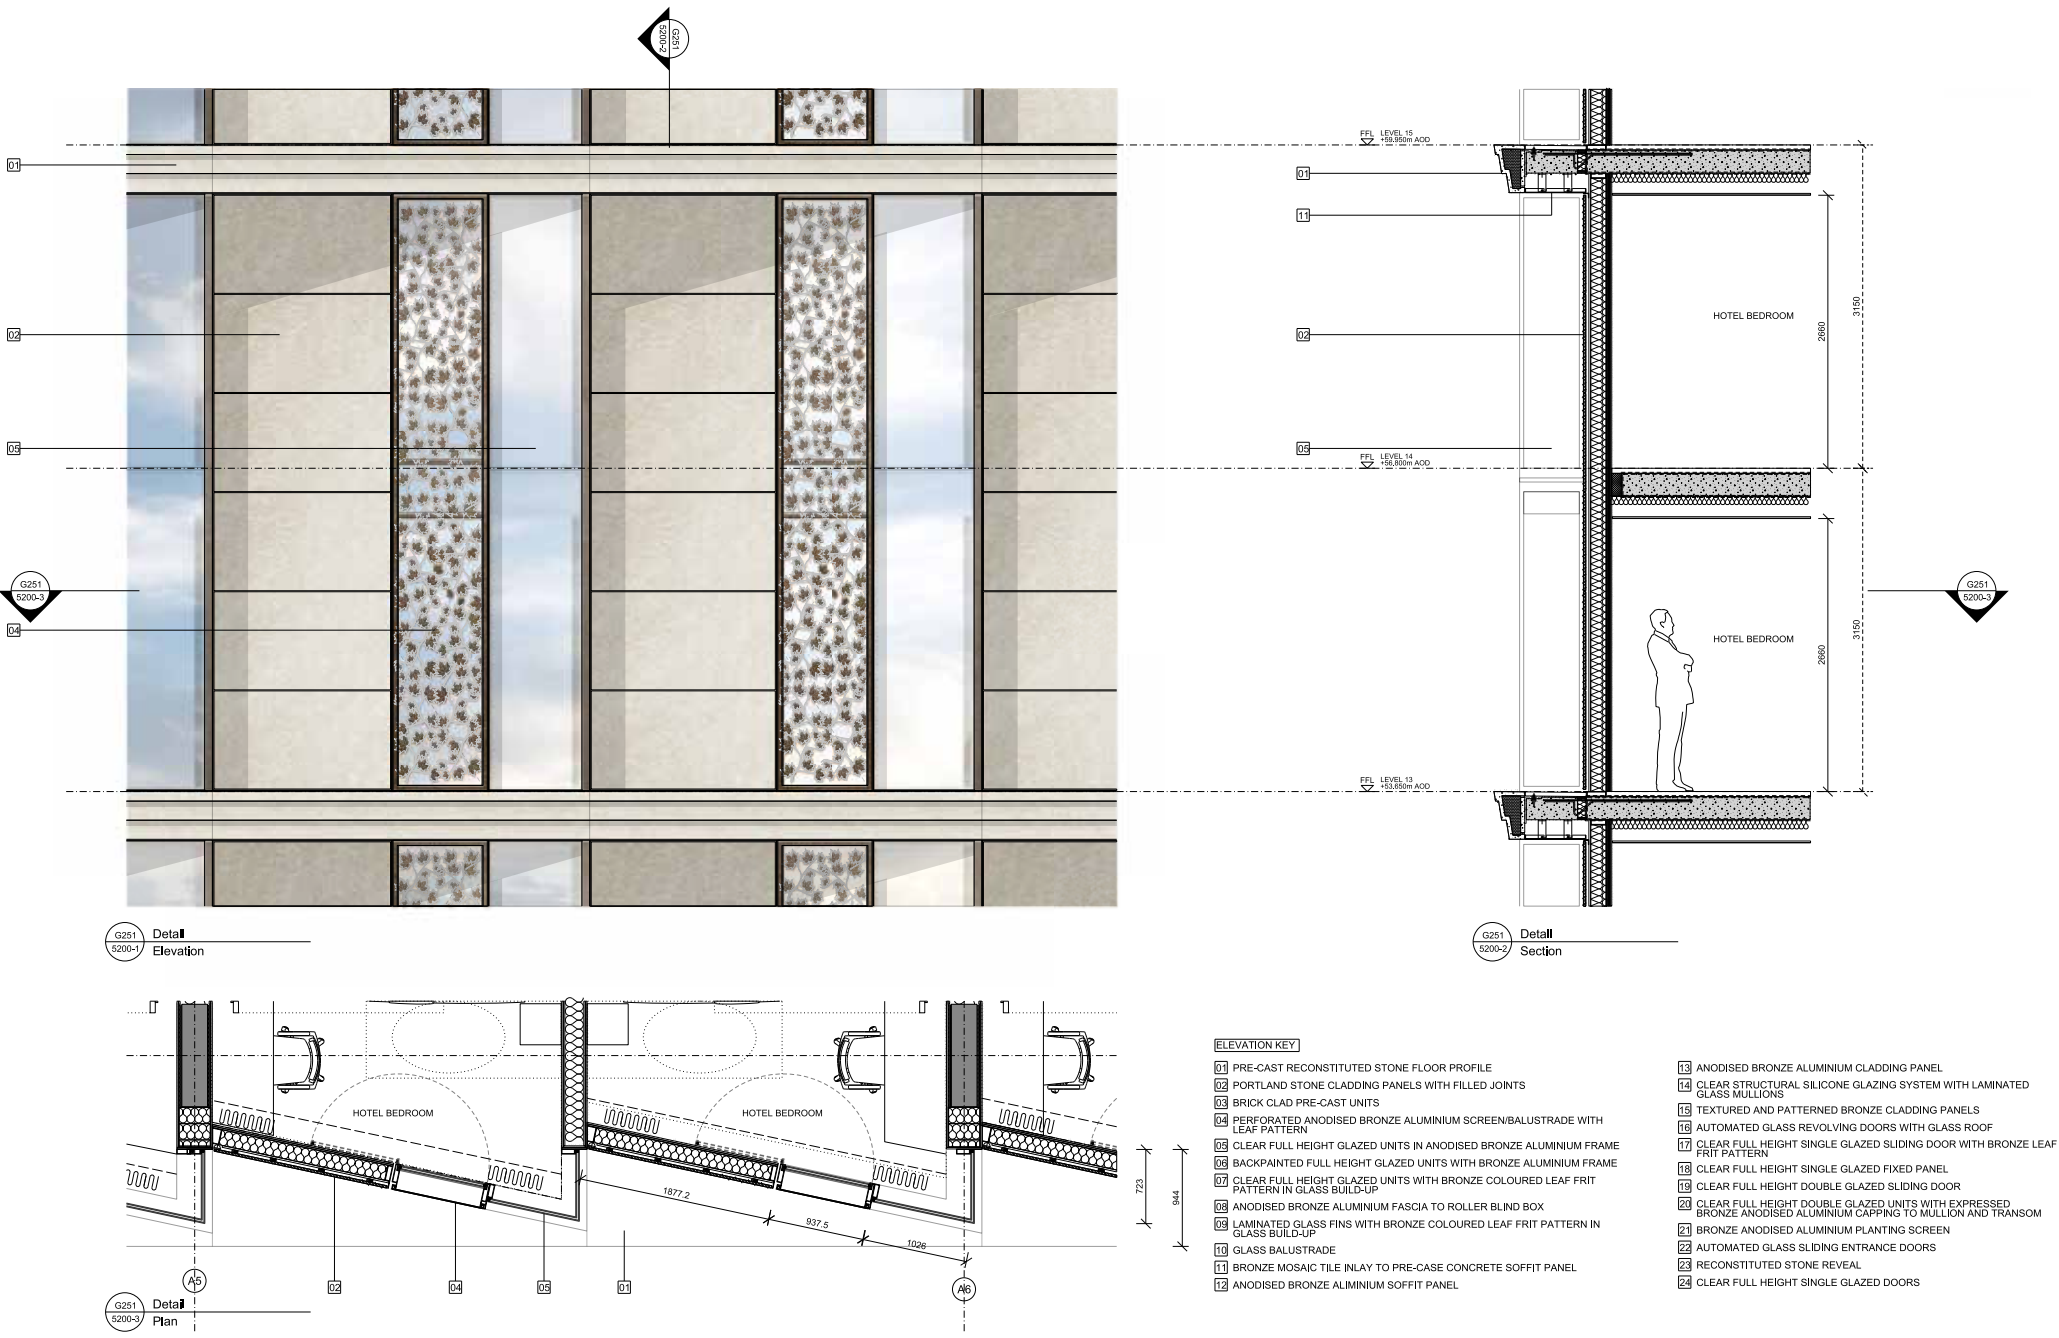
97 Extract of a planning submission drawing illustrating the detail design intent for the facade of the saw-tooth hotel facade to the Garden Square
